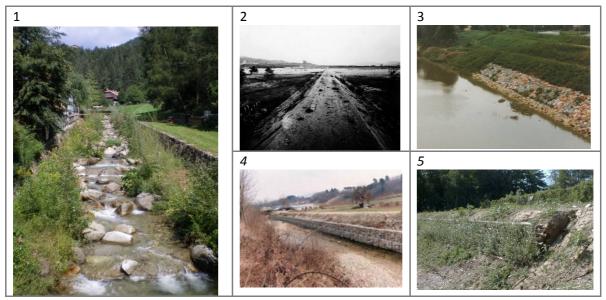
49 Bank protections types. (1) Bank walls (2) groyne; (3) rip raps; (4) gabions; (5) bioengineering bank stabilization.
